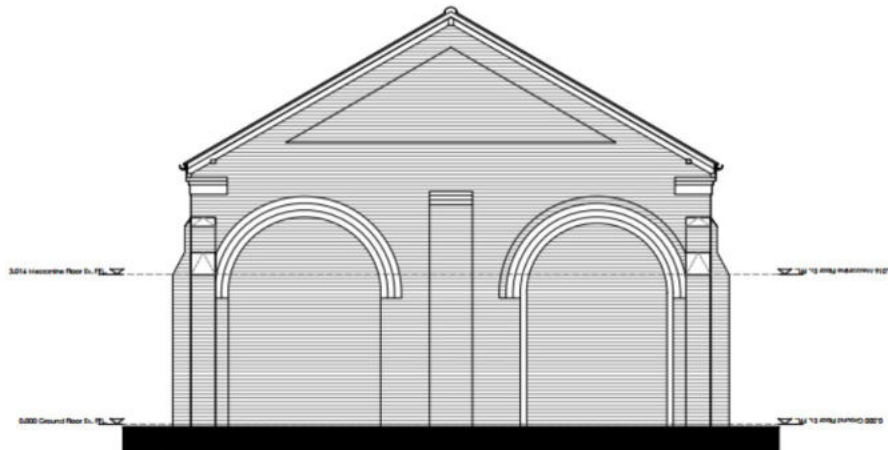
Current Existing South West Elevation Facing Existing Yard Area
